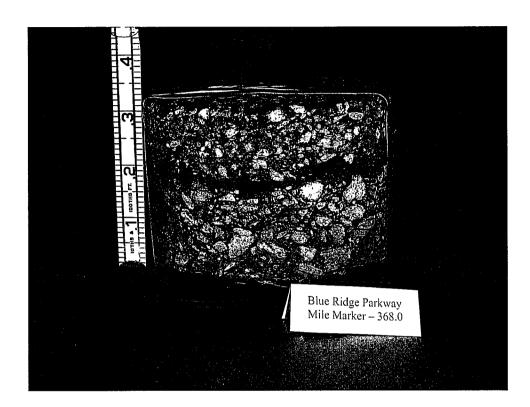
Additional Asphalt Cores Mile Marker 368.0
